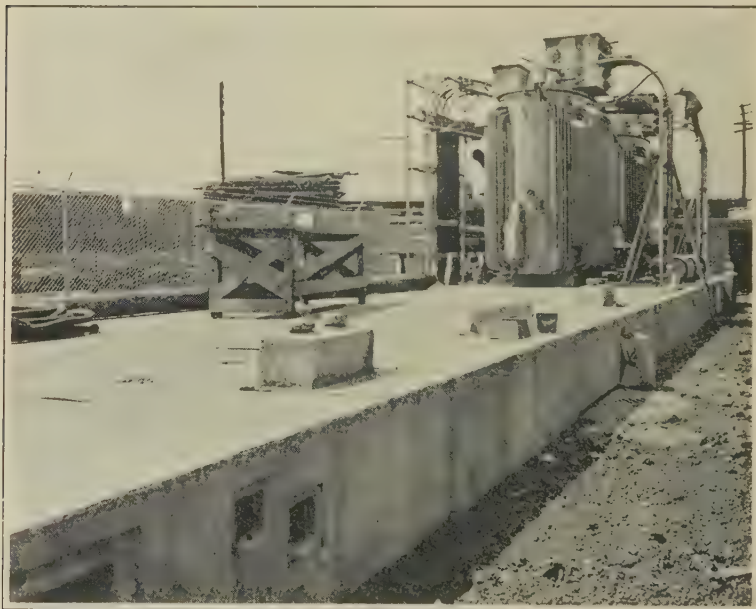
ONE OF THE RECENT TRANSFORMER MATS CONSTRUCTED AT NORTHEAST SWITCHING PLANT.
